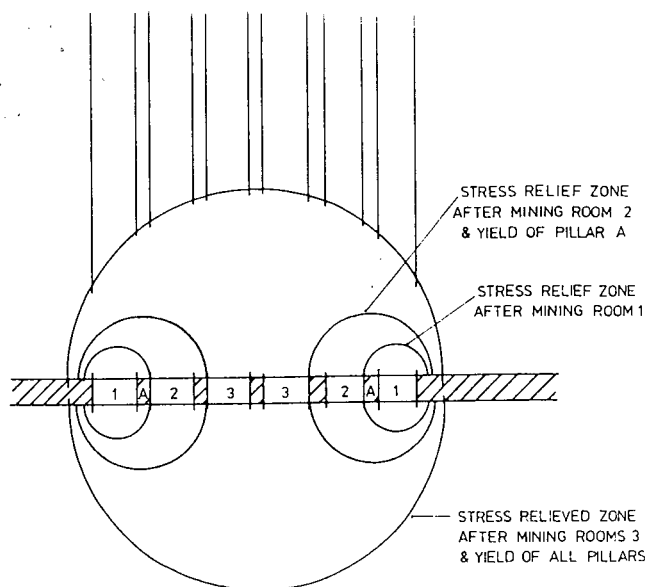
A yield pillar layout for a six entry system, illustrating the development of a stress-relieved zone.
